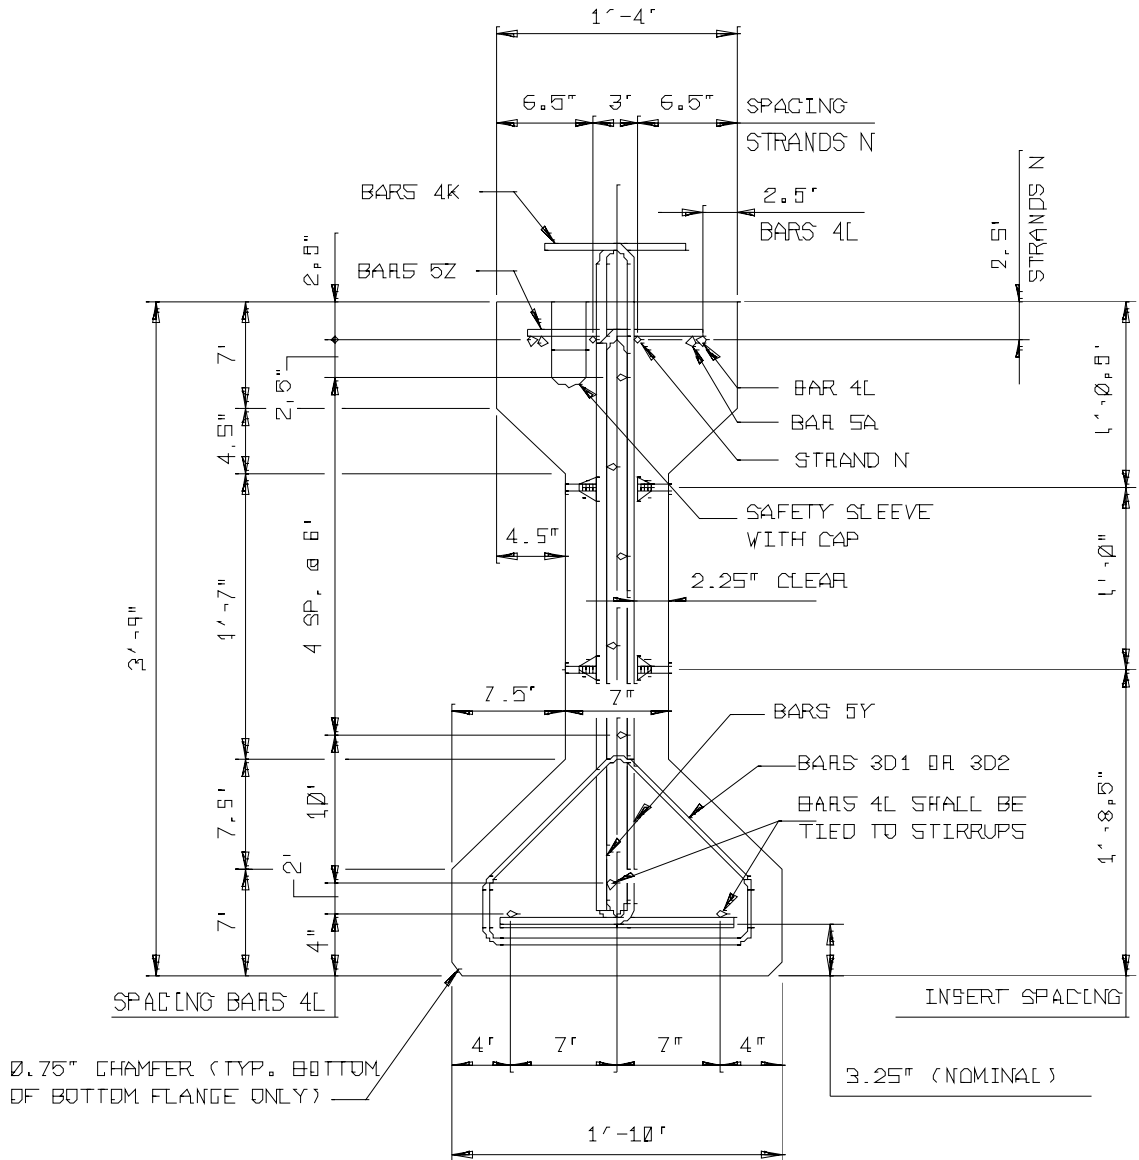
Typical Rebar Detail in Type III AASHTO Girder.
